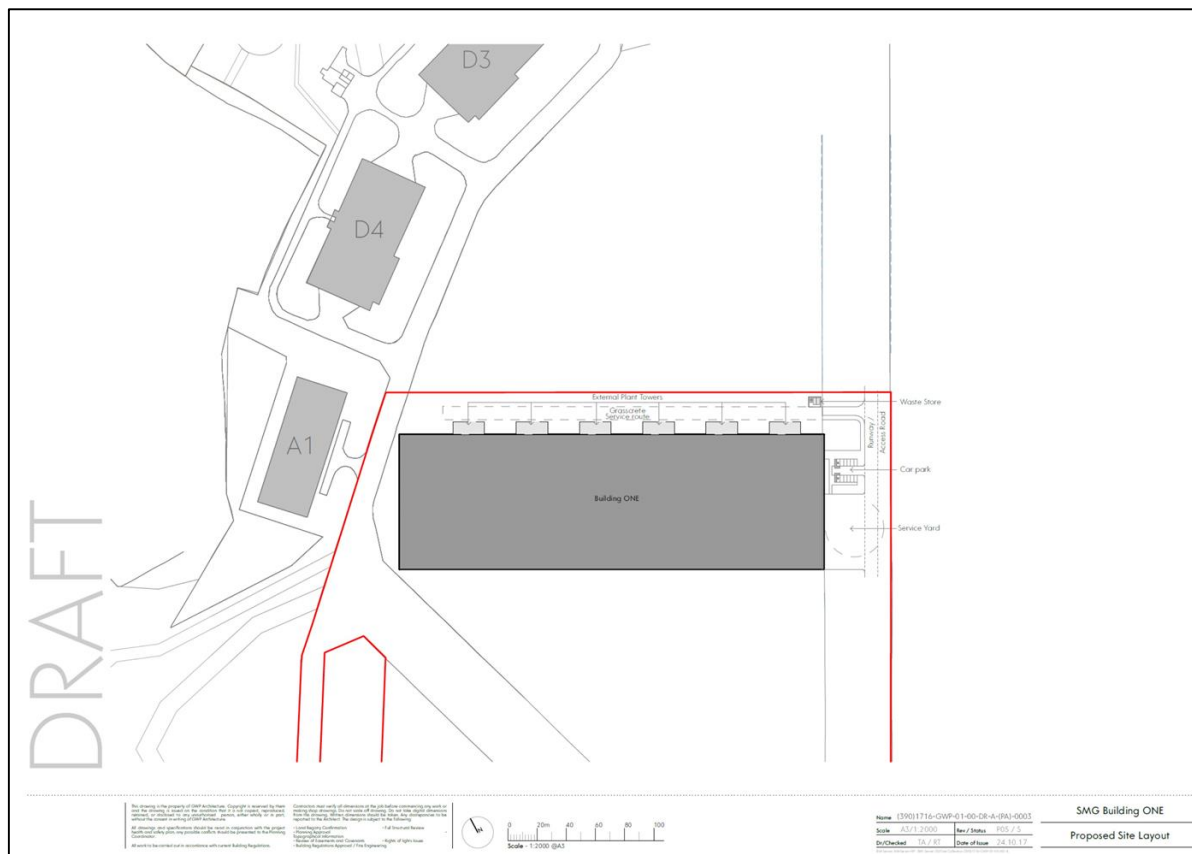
Proposed Site Layout ((390) 1716-GWP-01-00-DR-A-(PA)-0003, prepared by GWP Architecture, October 2017
